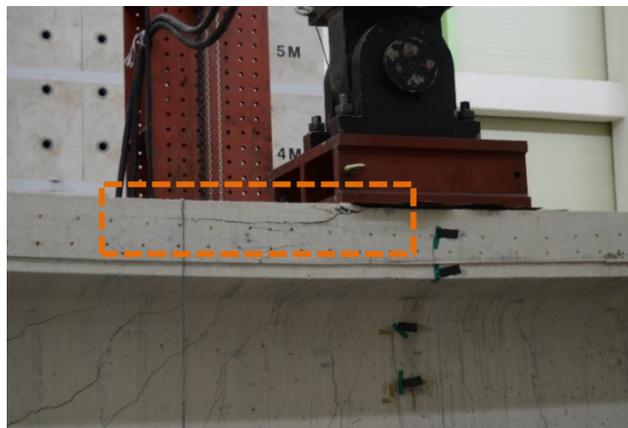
Concrete crushing of deck of Sansung-Woochun
